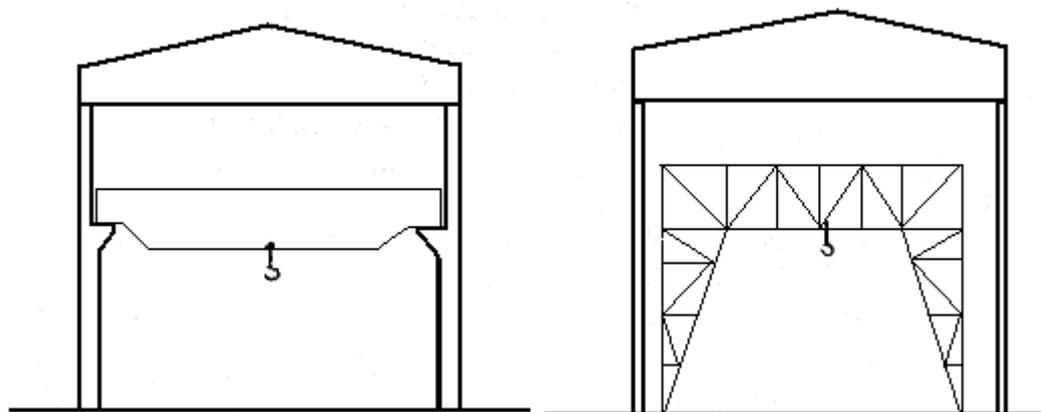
Reducing seismic impact by replacing overhead cranes with floor cranes.
